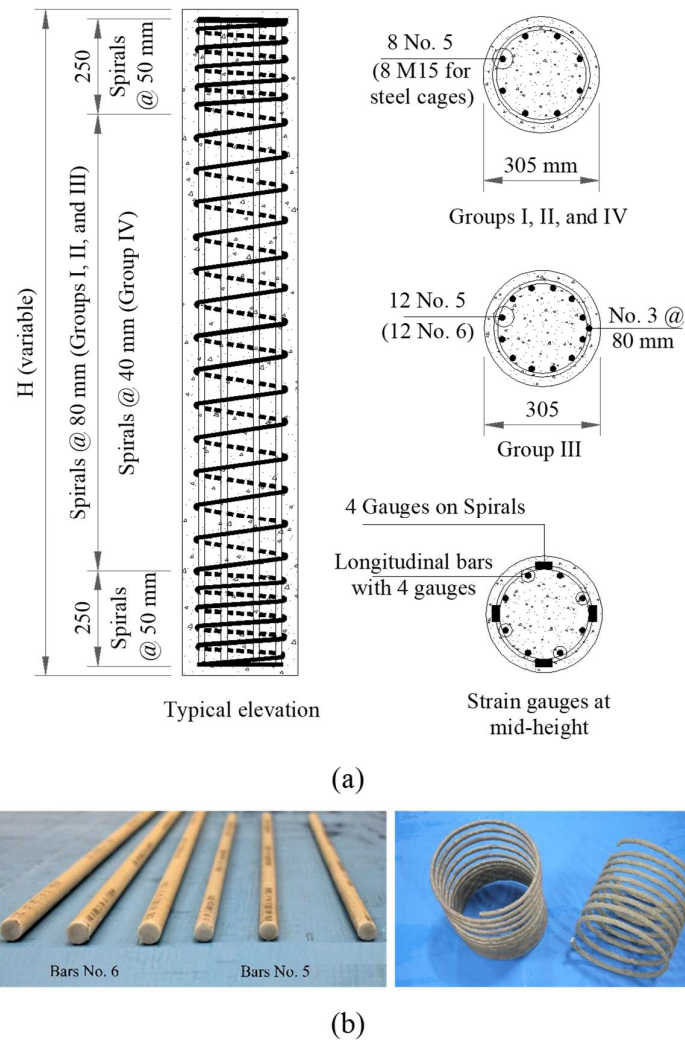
(a) Typical layout, reinforcement details, and internal instrumentation; (b) samples of the GFRP bars and spirals. (Note: Dimensions in mm; 1 mm = 0.0394 in.)
